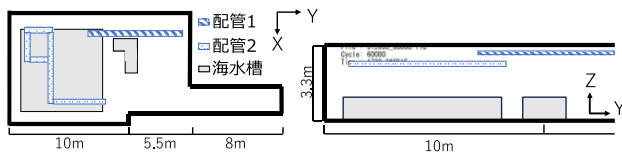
Location of piping and seawater tank (left: plan view, right: elevation view)
